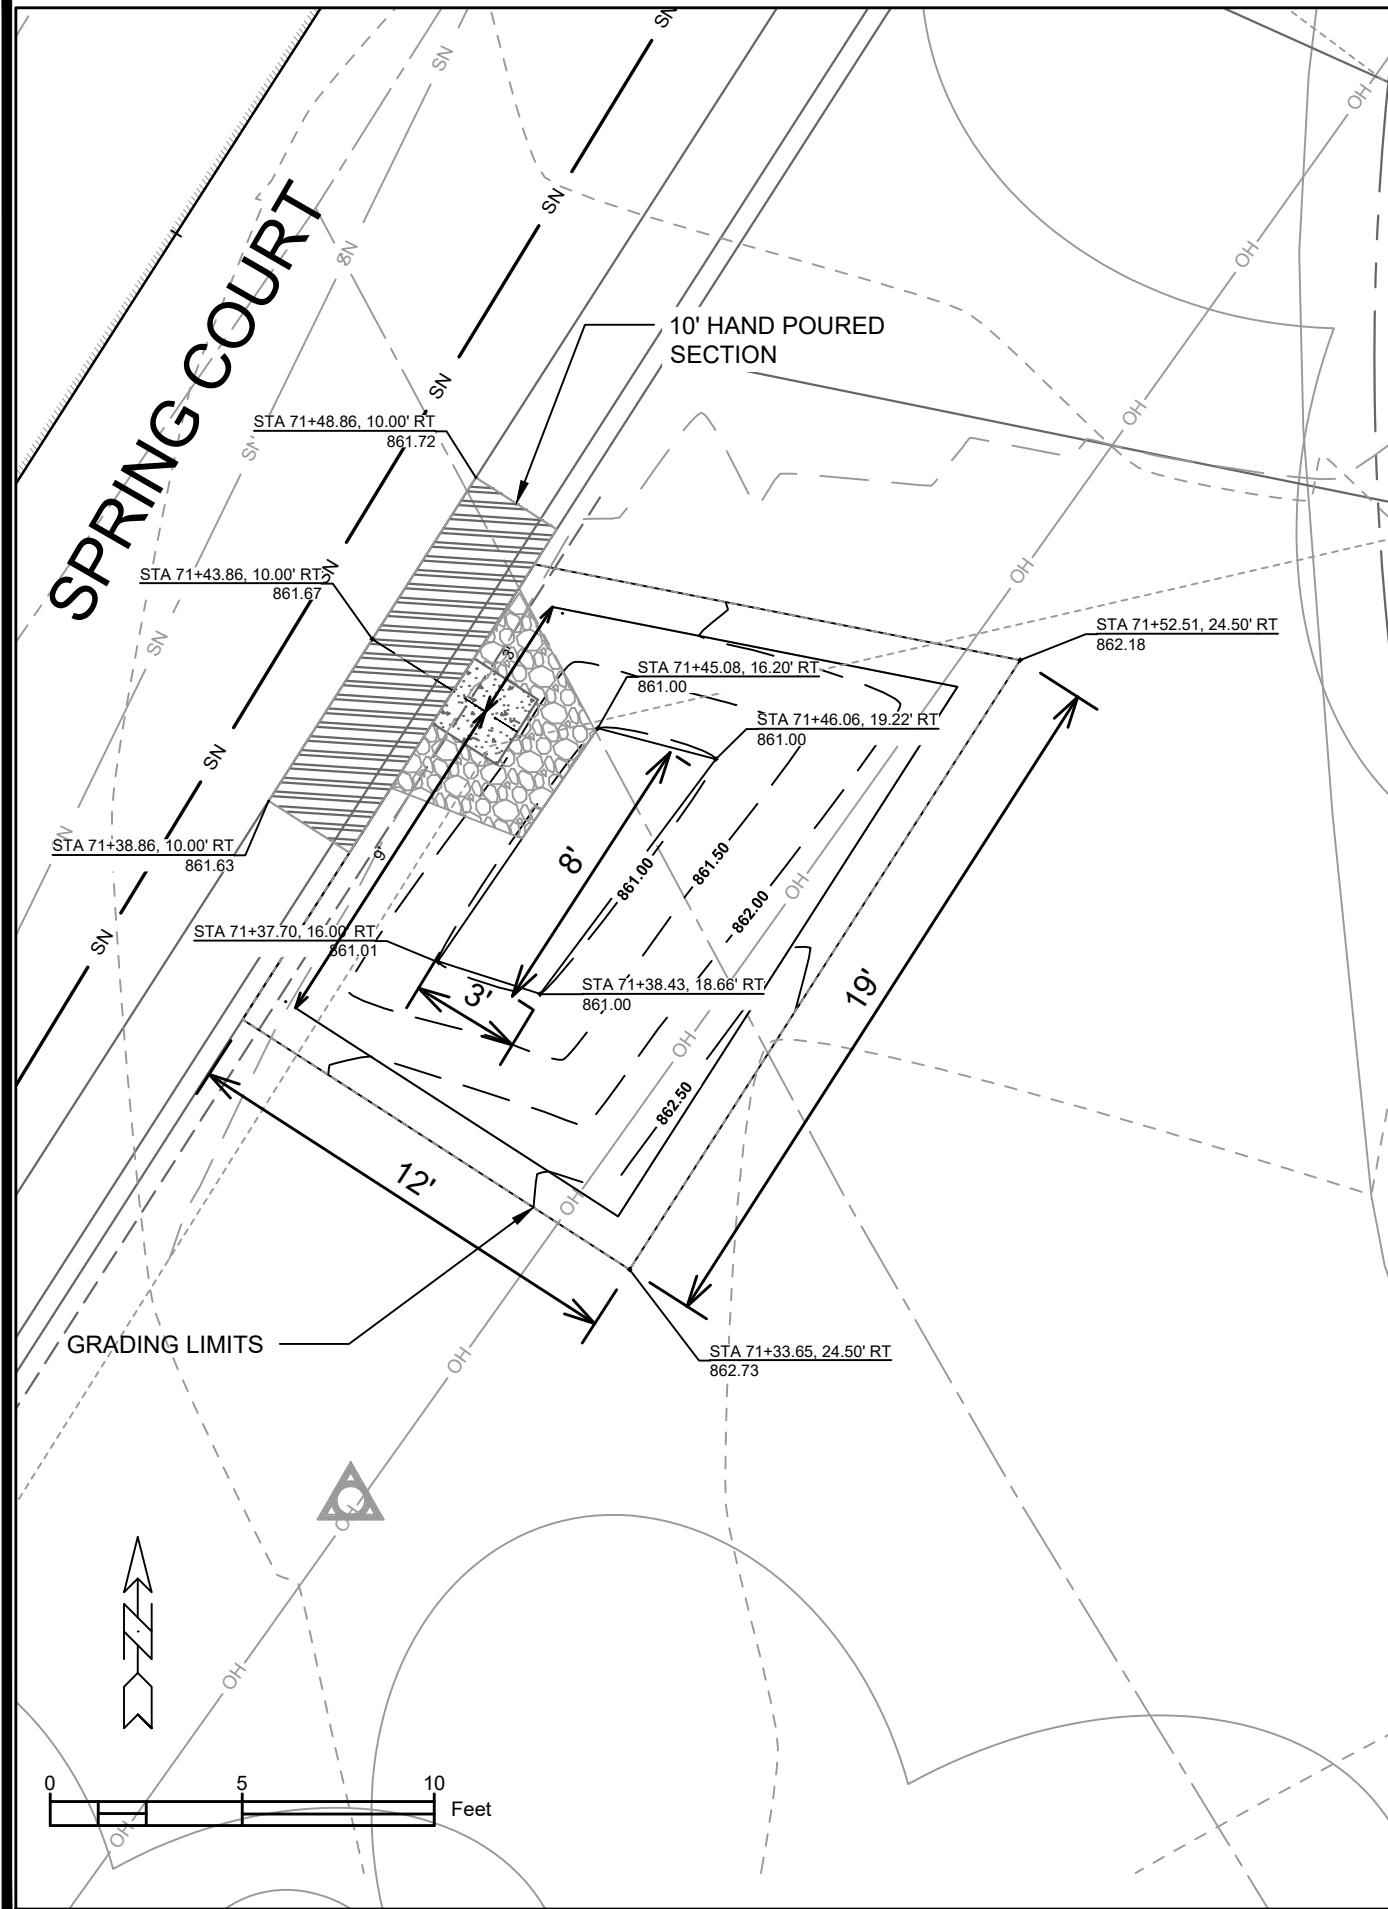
DETAIL POINT ELEVATIONS/DESCRIPTIONS
